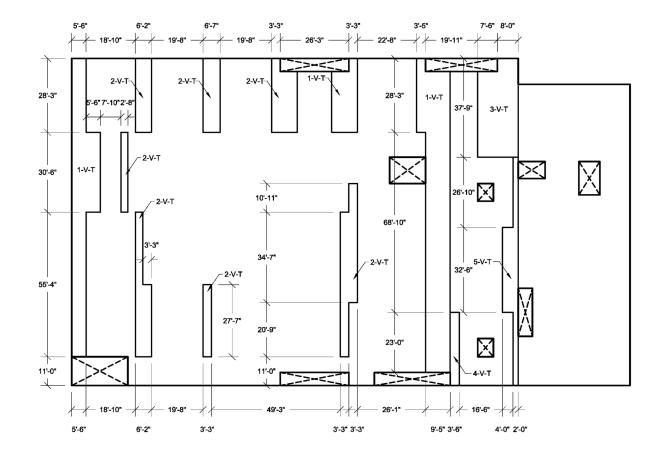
H.3-37b Elevation 35 Looking Down Vertical Transverse Reinforcement Zones
